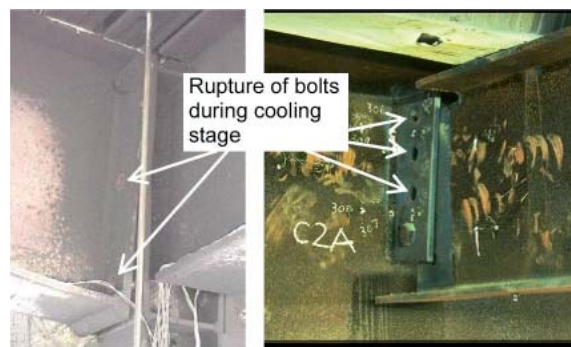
Failure of bolts in steel connections subjected to natural fire
